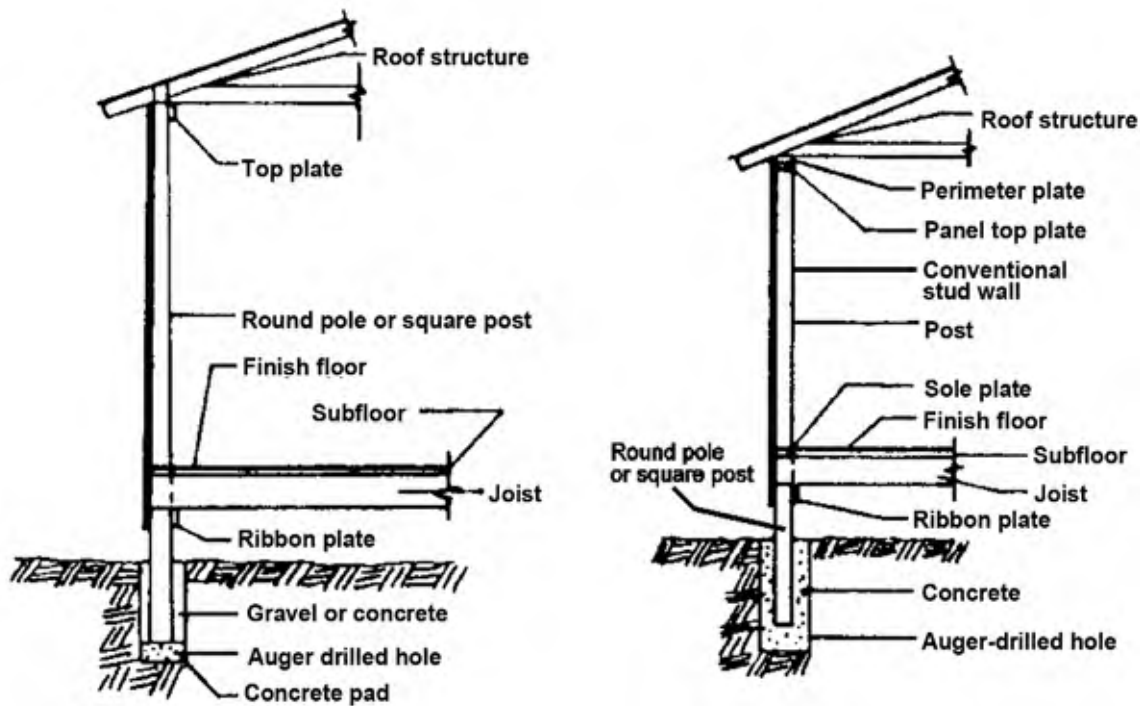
Pole and post-frame buildings: (left) pole or post forms both foundation and wall; (right) pole or post forms only the foundation for conventional platform-framed structure.
